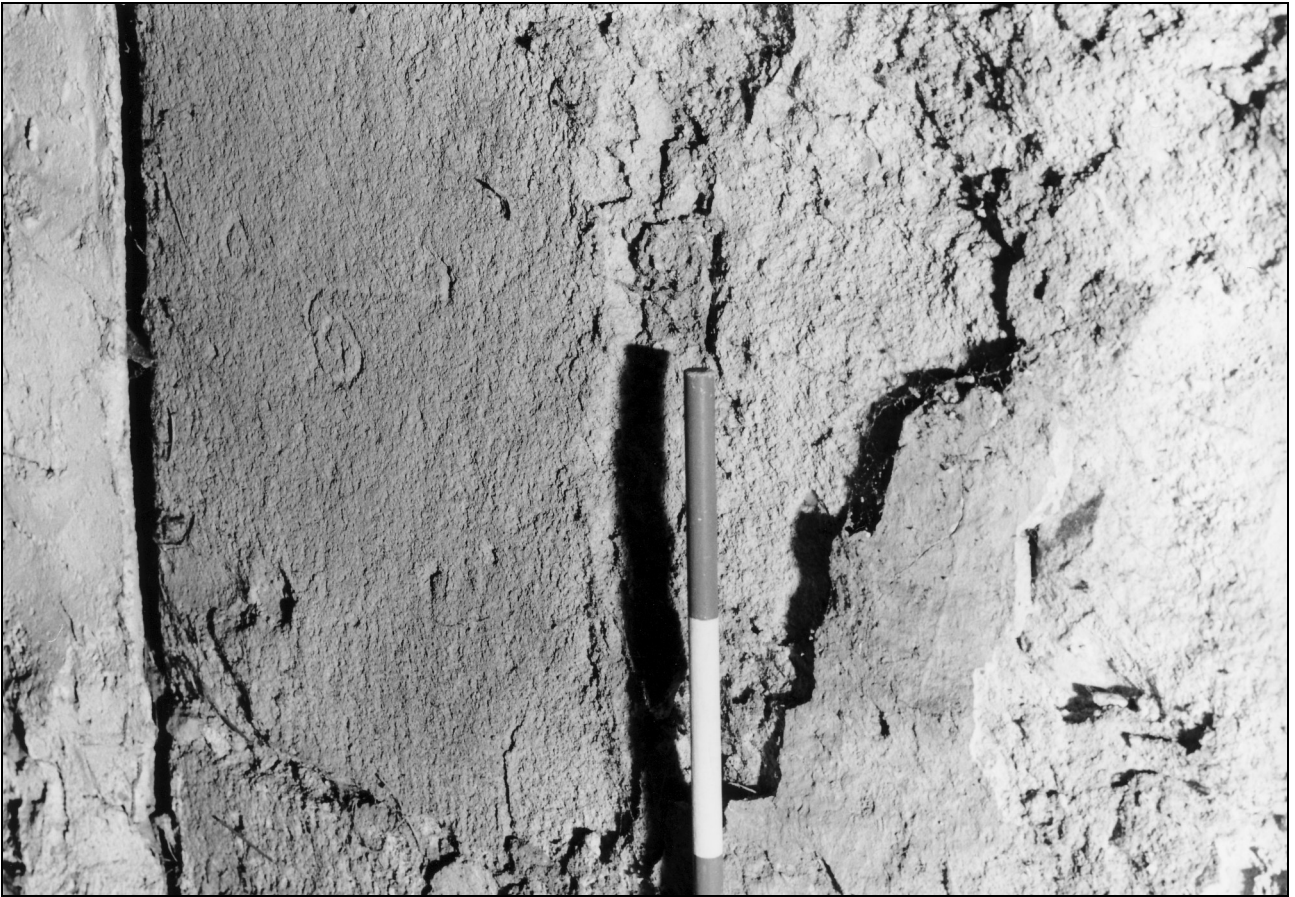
Detail of mason's mark on first floor doorway (D1) in north-west elevation (interior)
